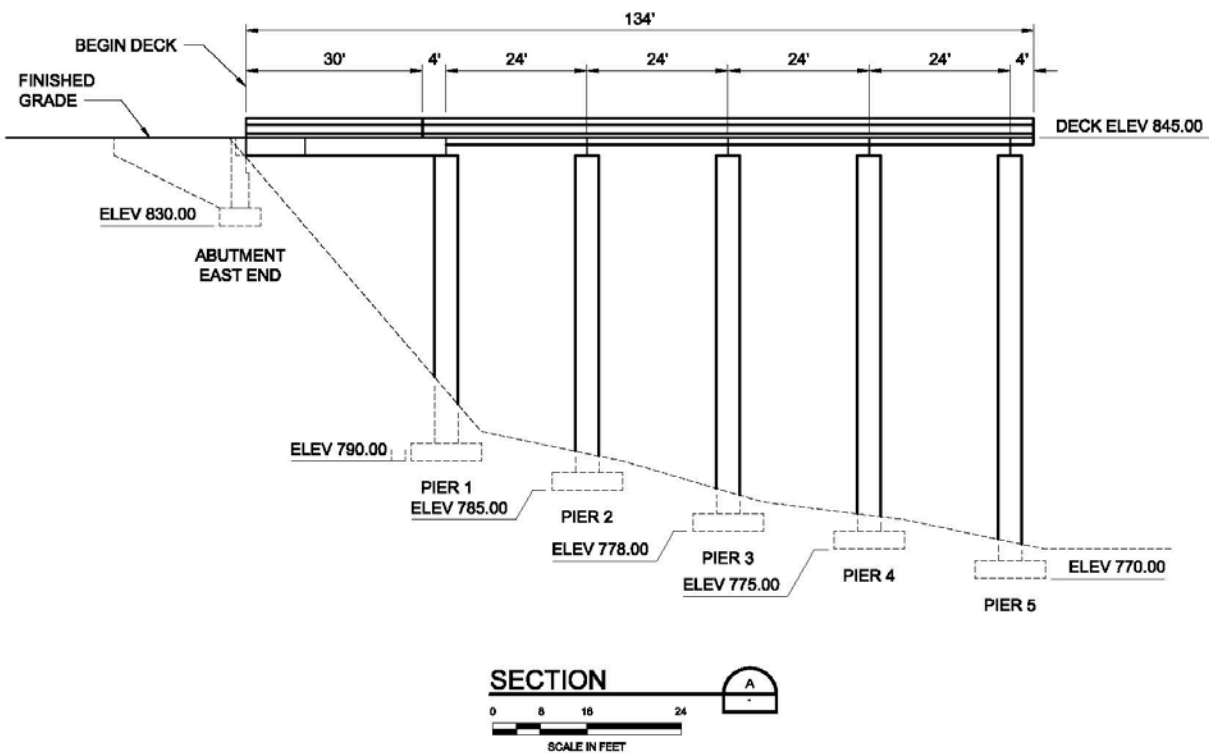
Proposed Ward's Ferry take-out deck looking downstream.
